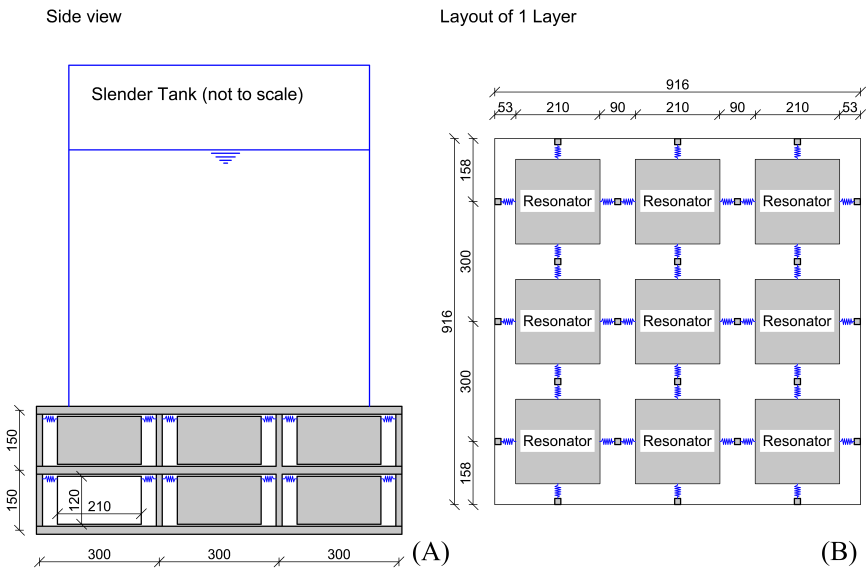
Drawings of the structure: (A) side view of tank and metafoundation; (B) layout of one layer (dimensions in cm).
